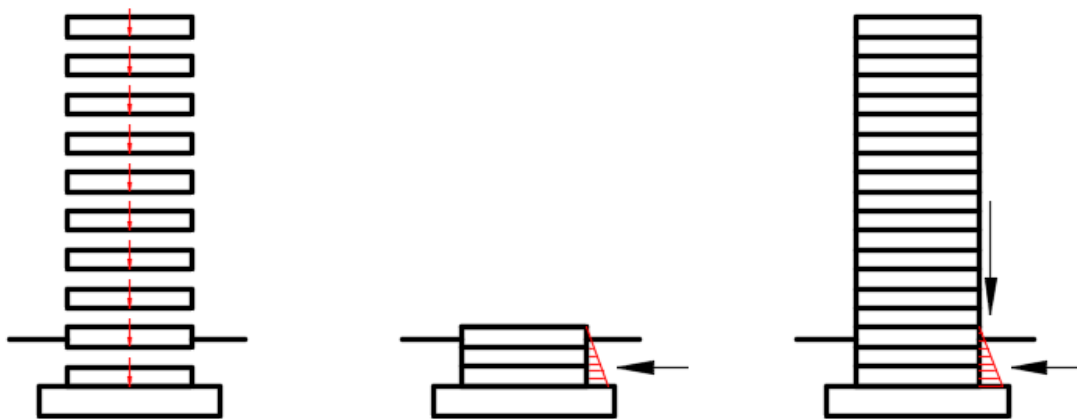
Illustration of the "Montage" mode when determining the SSS for the underground wall.
